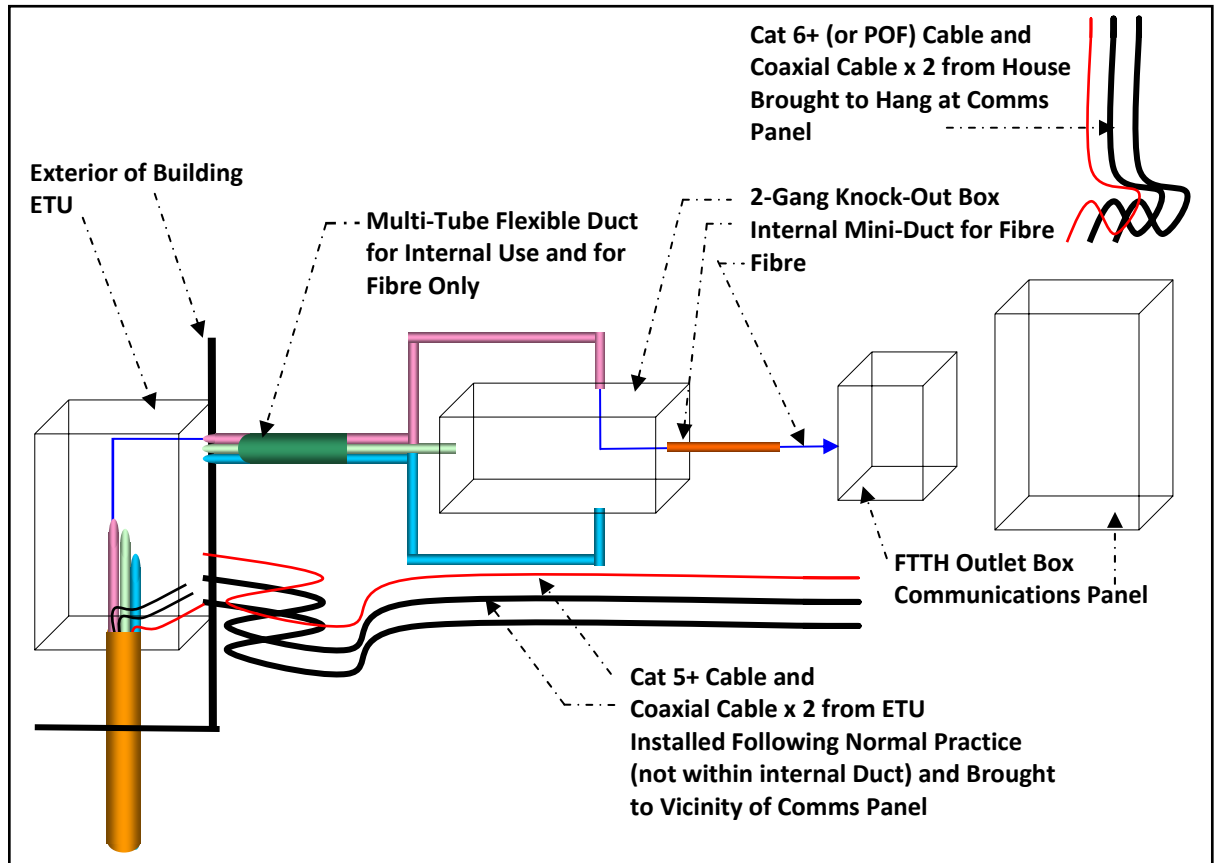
Internal Open Access Ducting From ETU to the Knock-Out Box
